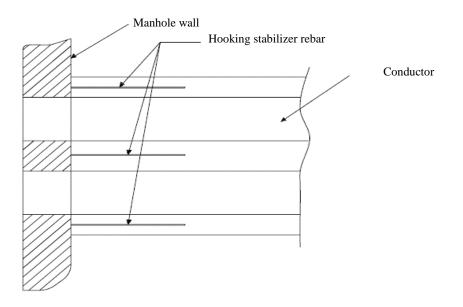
Reinforcement of connection of cable transition conduit with manhole
